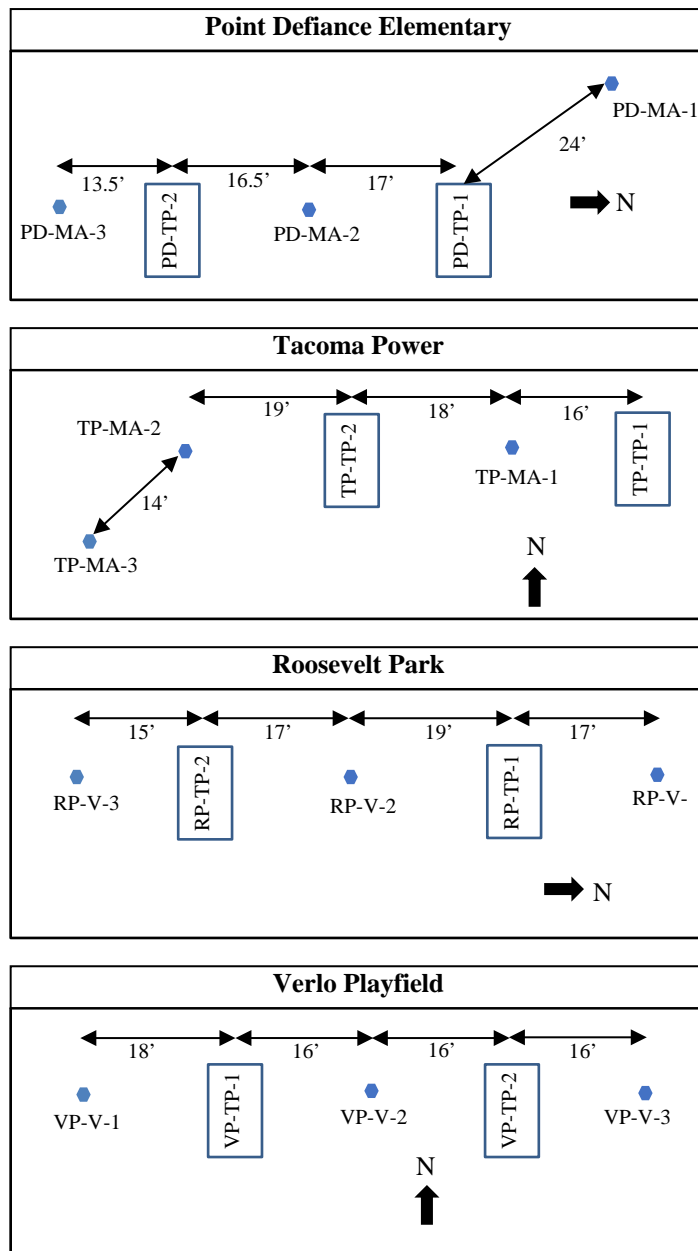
Cross section showing typical arrangement of test pits and wells and approximate water levels during tests.Fig. 3: Test Site Layouts (not to scale).
